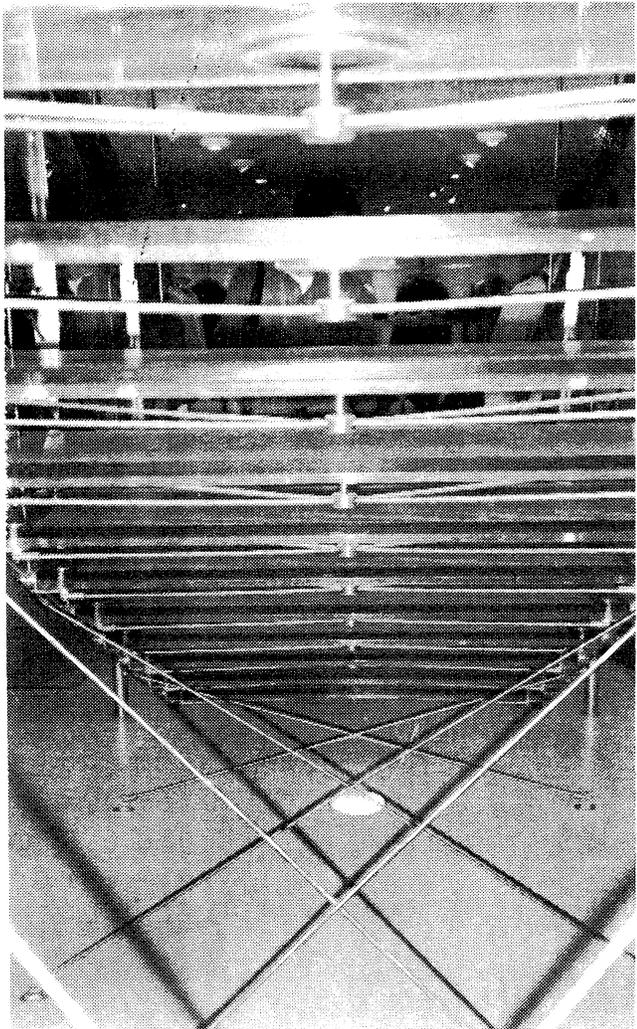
Eva Jiricna Architects: Handrail Composition.
